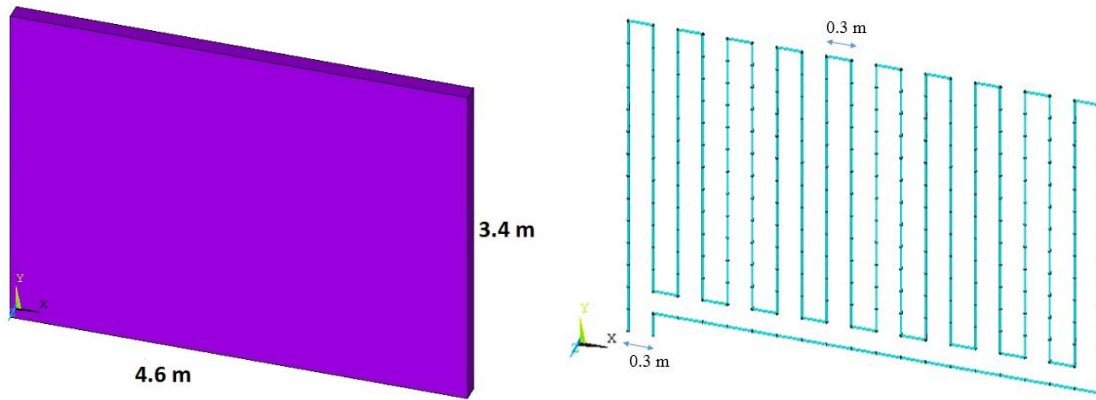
Concrete slab (left), piping system layout (right) in FE modeling
